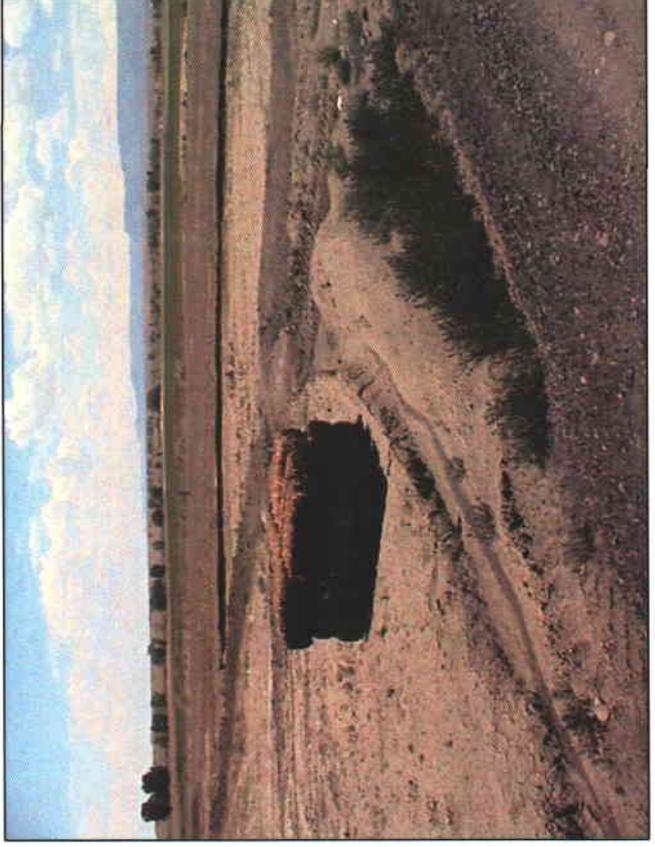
Drainage channel and additional straw bales (if needed) for erosion protection.
